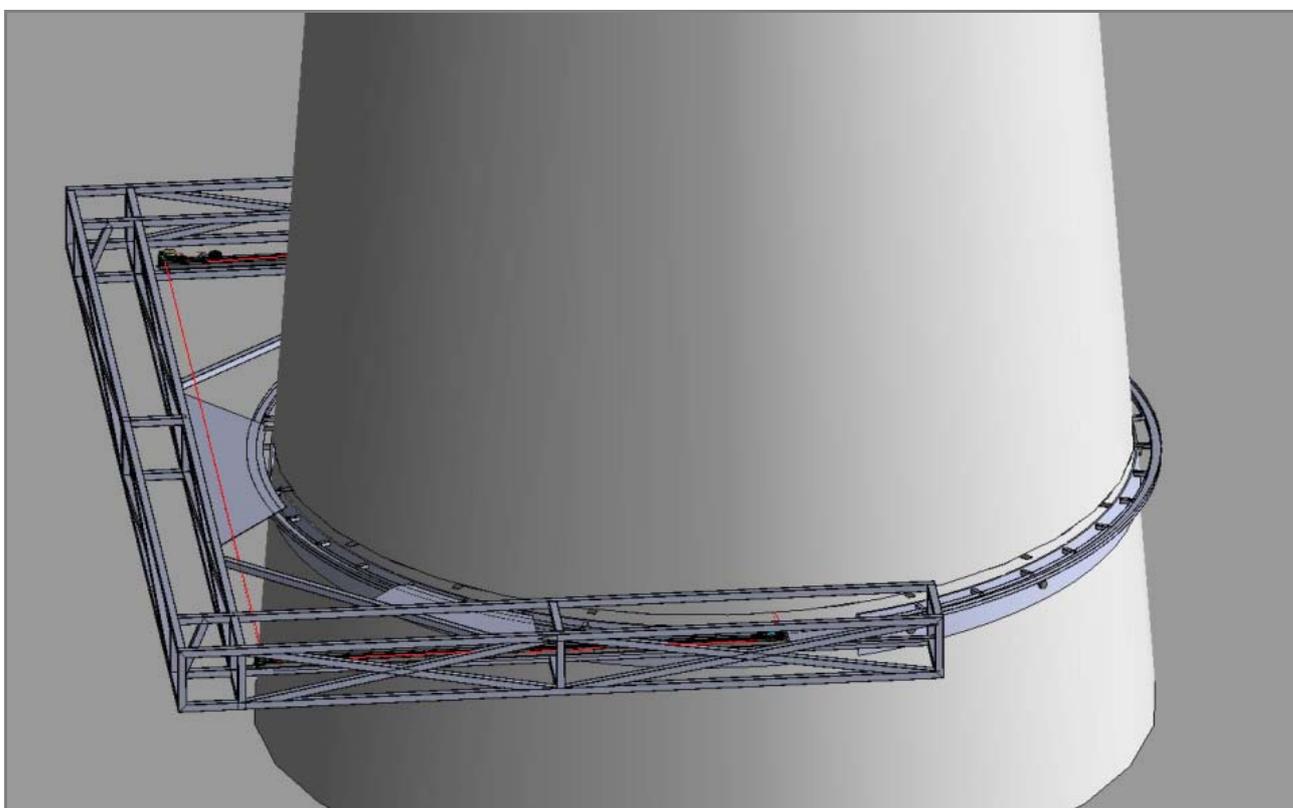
Wire progresses through the leg until it reaches the first cut line. On completion of the cut the DWCM and guide system would be transferred to the next cutting location.
